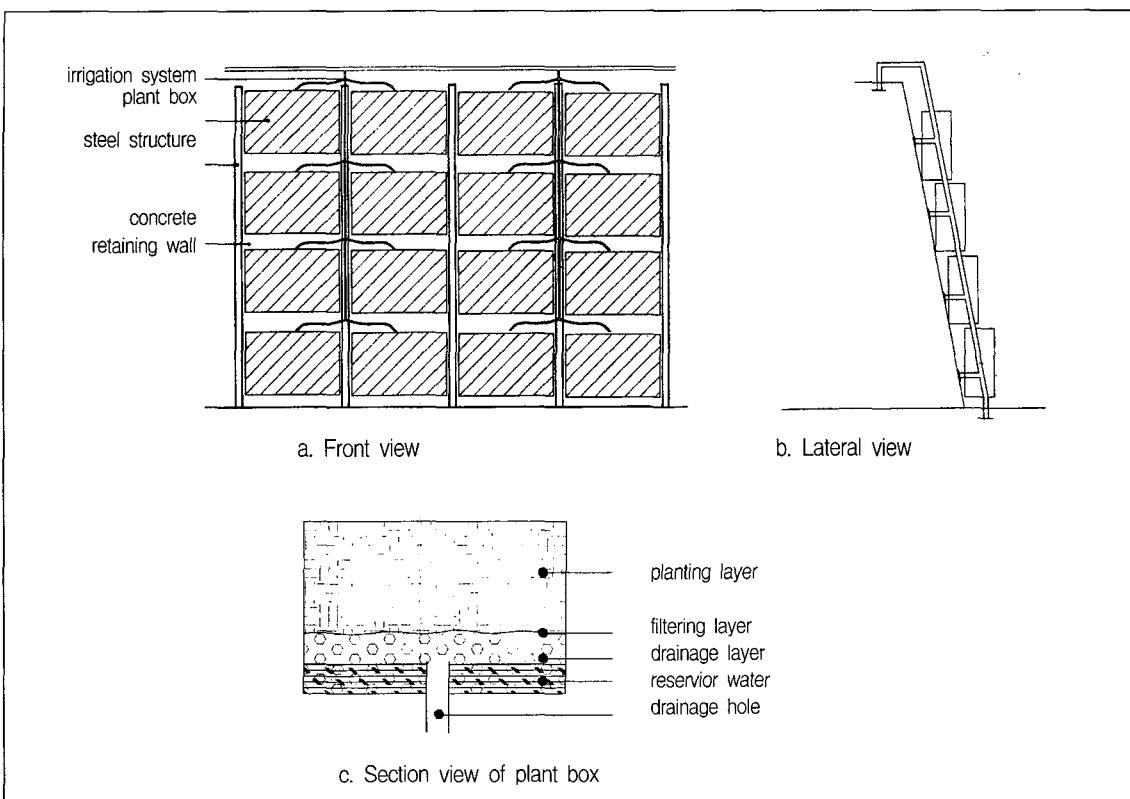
A green wall system proposed for the concrete retaining walls shown frequently in Tongyeong city.
